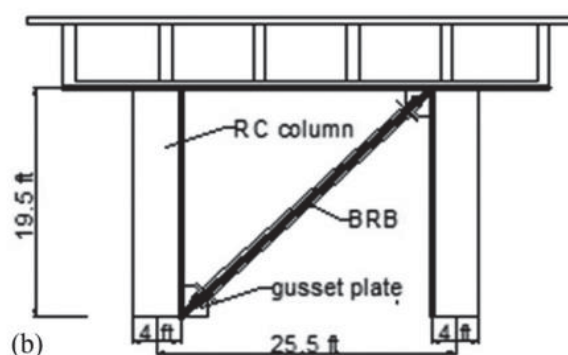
A two-columns framed pier strengthened by an BRB diagonal “structural fuse” proposed in [17].
